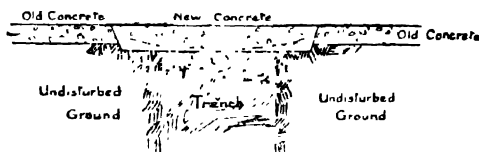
Section showing Reinstatement of Concrete Slab over Trench.
